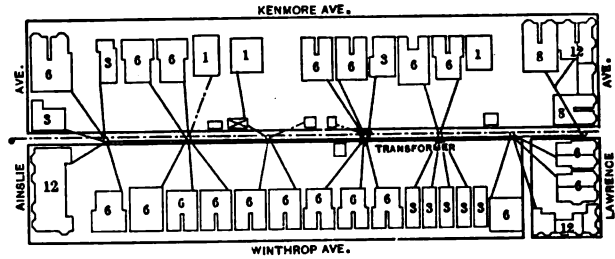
BLOCK OF APARTMENT BUILDINGS
